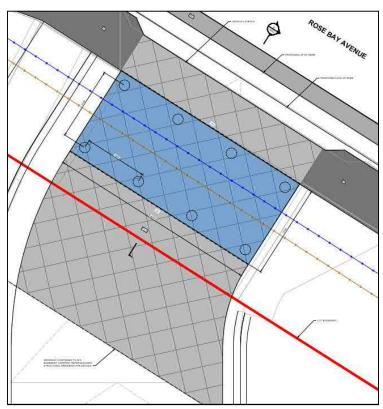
Proposed Carpark Driveway Entry at Rose Bay Avenue
